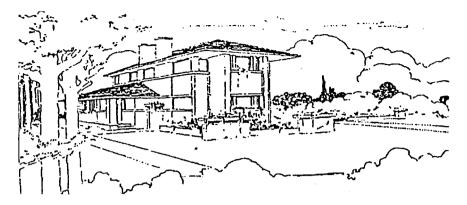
Sketch for a simple rural house, Jan Wils, Architect, 1922. The drawing, with just as crudely executed plans, was published in Wils(1922).
